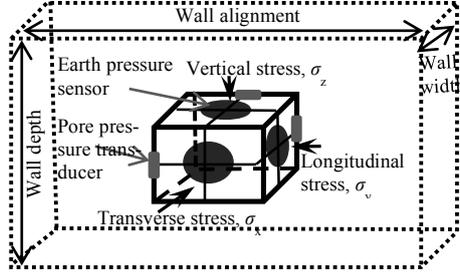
Diagram of earth pressure cage installed within the trench wall.
